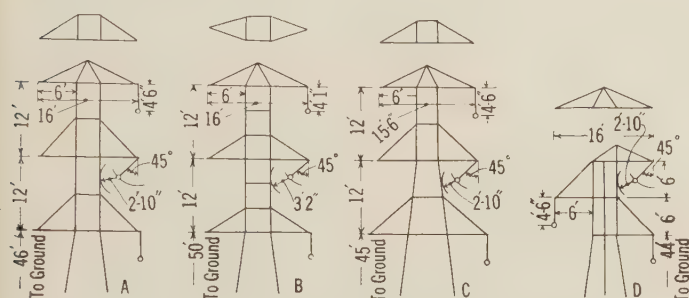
TYPES OF TOWERS SHOWING DIMENSIONS AND CLEARANCES
